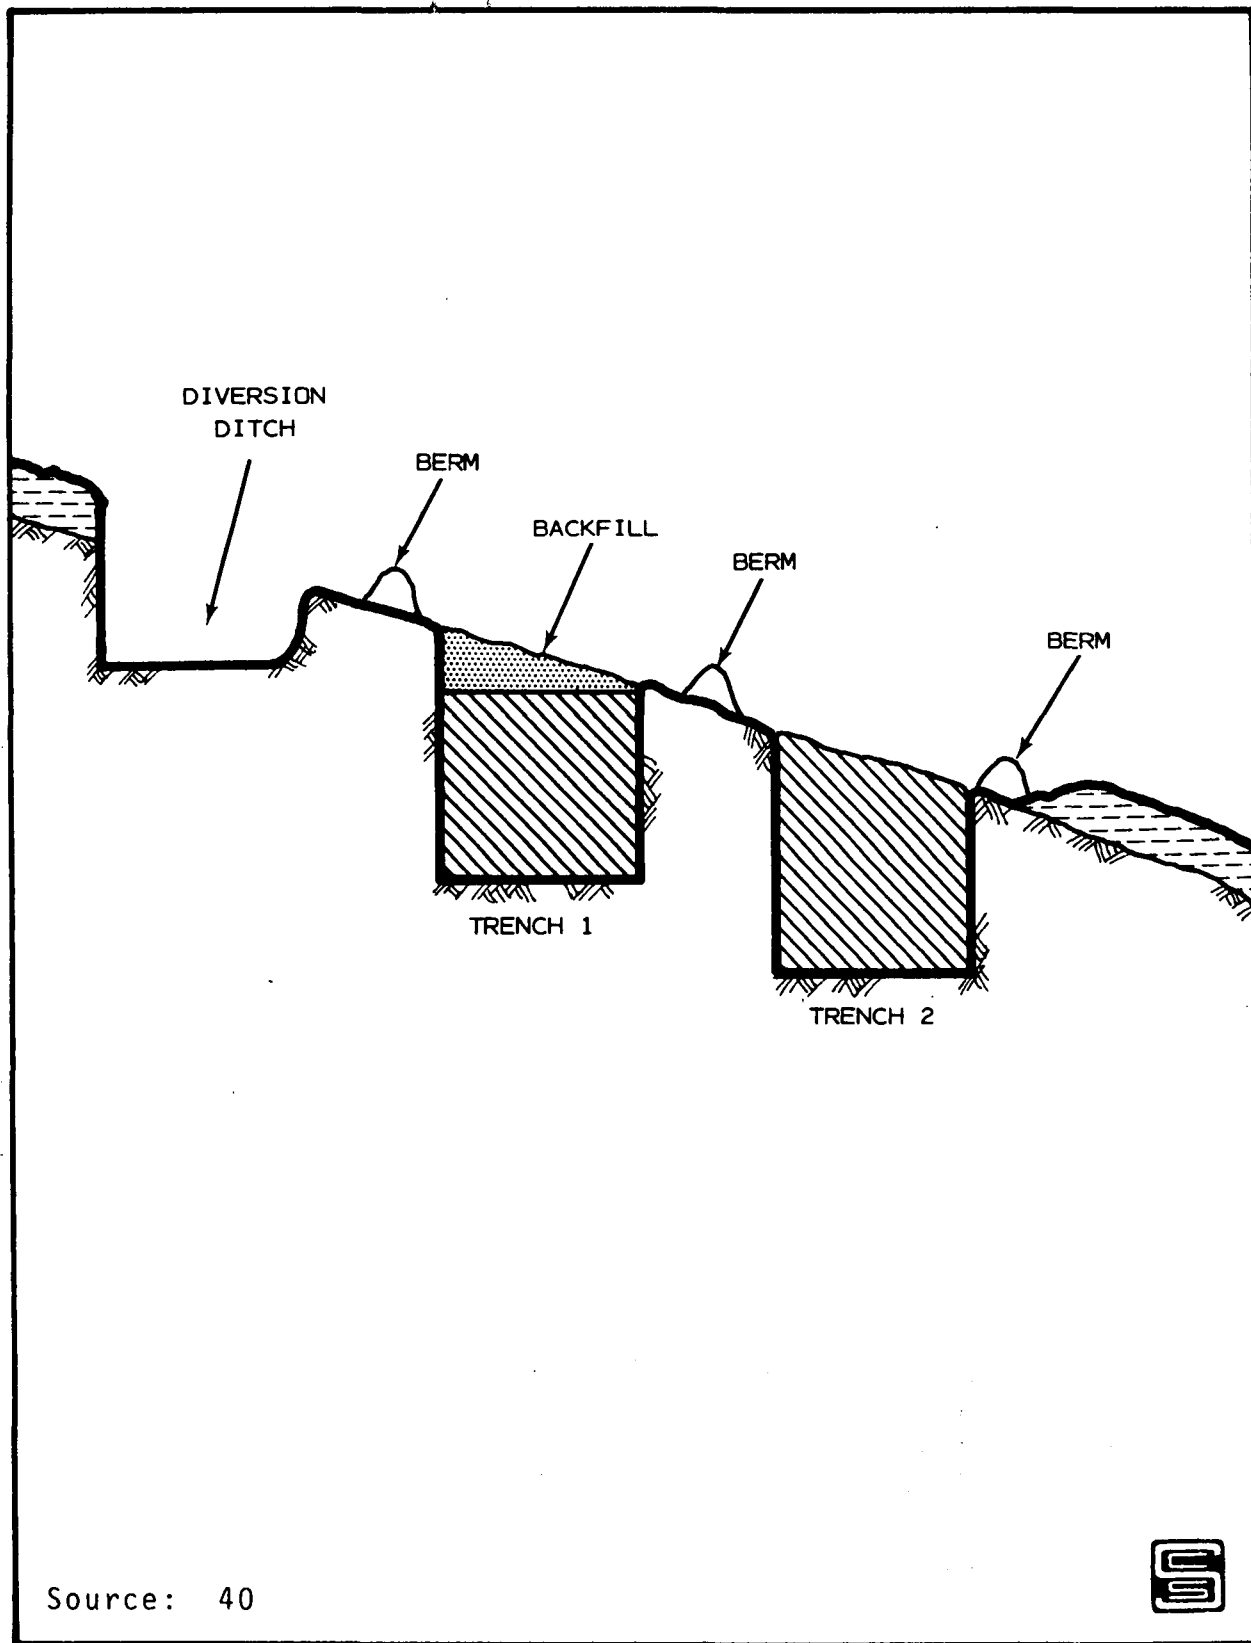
Burial trench arrangement to impede horizontal water infiltration through the topsoil
